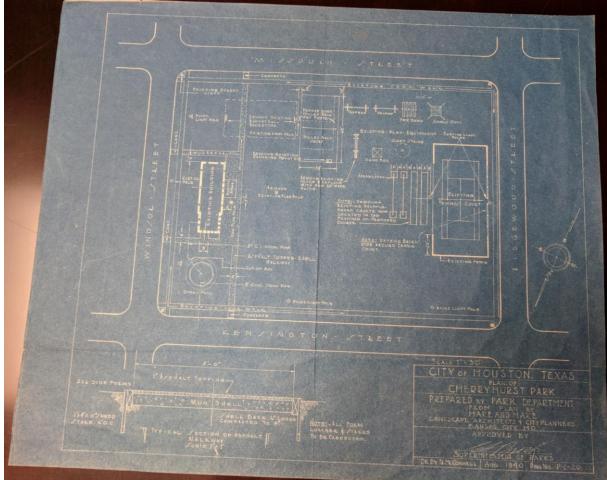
Exhibit B Site Map Cherryhurst Park Clubhouse 1700 Missouri Street
